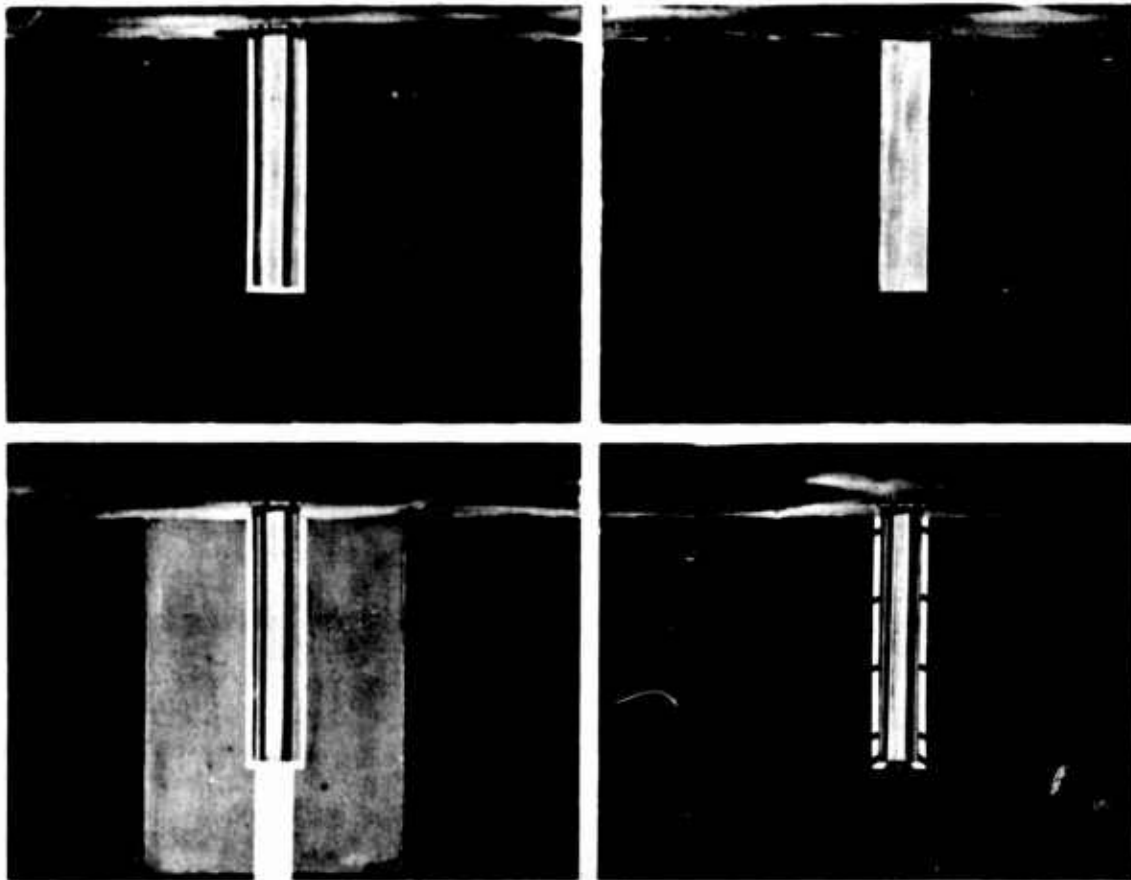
Rock-Site Method of Direct Sea-Floor Access. Consists of four steps: (1) bore a hole into the sea floor, (2) cement a lock tube into the bore hole, (3) ring drill the surrounding host rock and pump cement or other grout into the drill holes to consolidate the host rock, and (4) drill on into the sea floor below the lock tube.
